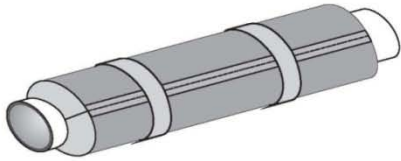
a. : GENERAL ARRANGEMENT OF APPLYING INSULATION ON PIPES RUNNING ABOVE GROUND IN COVERED SPACES OR IN DRY SHAFTS.
